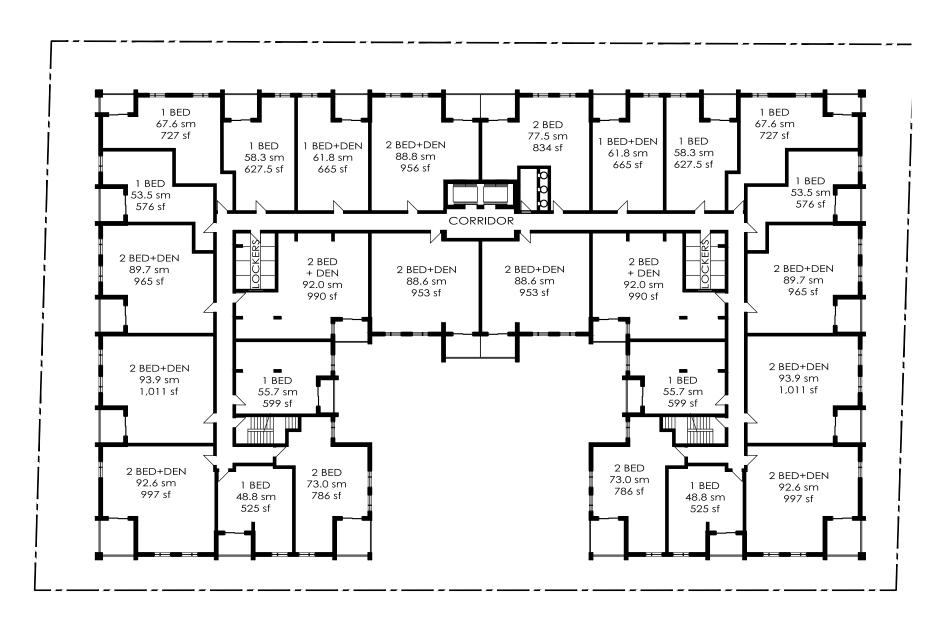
Third Floor Plan prepared by Lintack Architects Inc.
